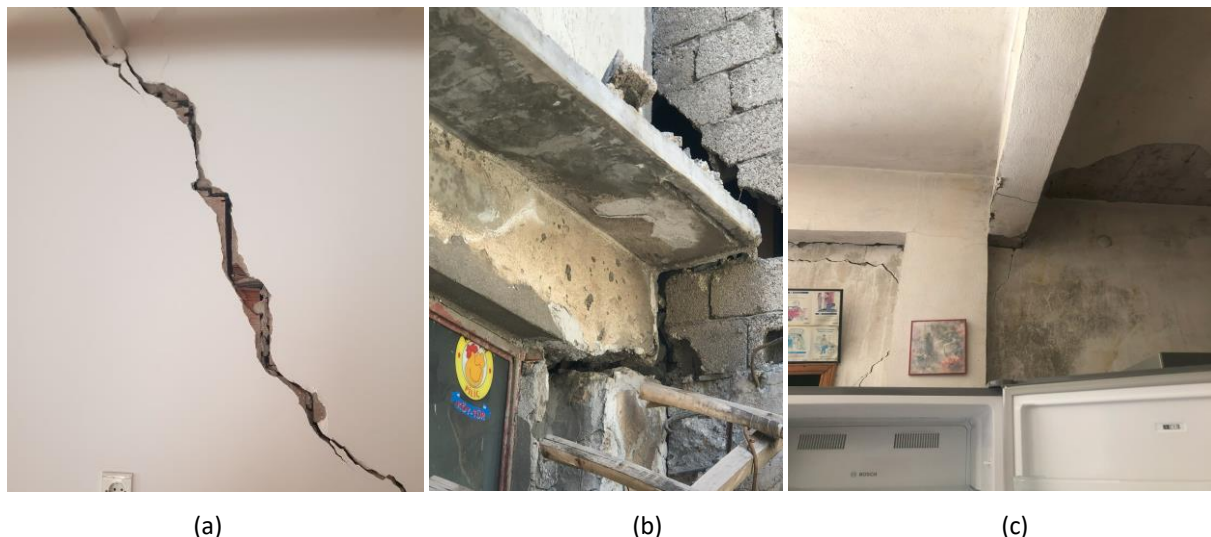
Structural/non-structural damages and construction errors (a) wall crack (non-structural damage in reinforced concrete structures), (b) separation of load-bearing elements (structural damage), (c) design error (structural damage) – Adiyaman; (Karataş, 2023)
